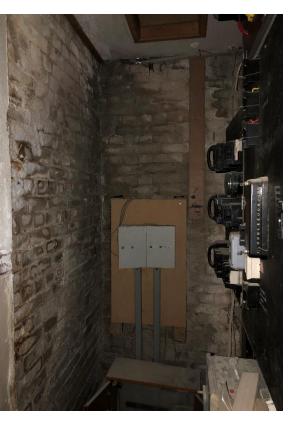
Ground Floor North West corner evidence of efflorescence to the brickwork internal leaf.
